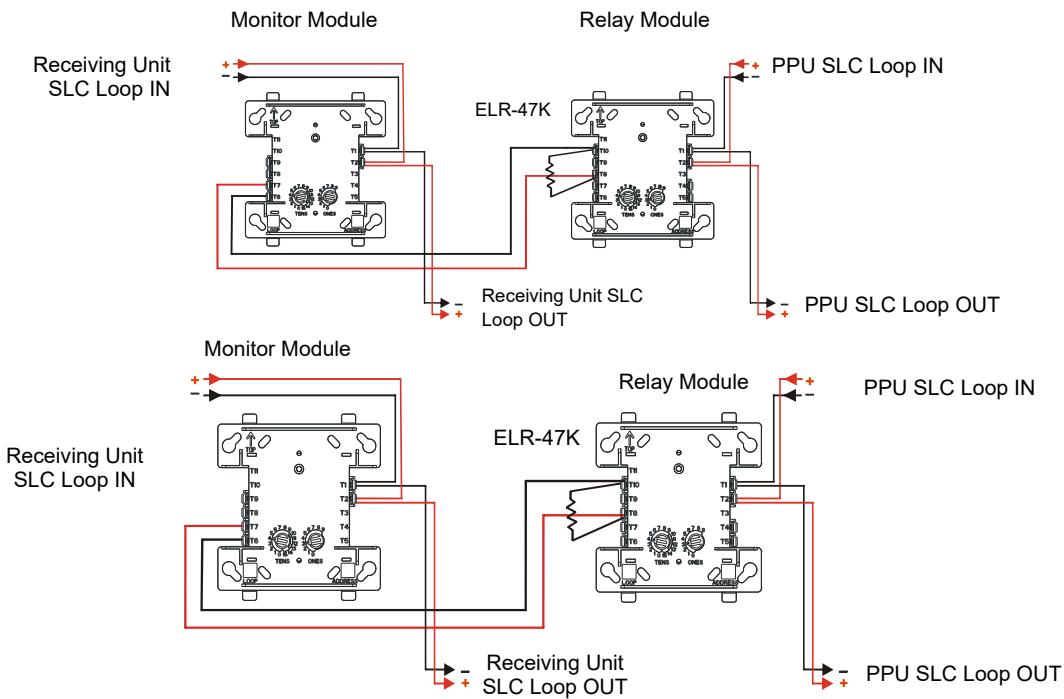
Typical Proprietary Fire Alarm Systems Wiring Connections: Detail Views
